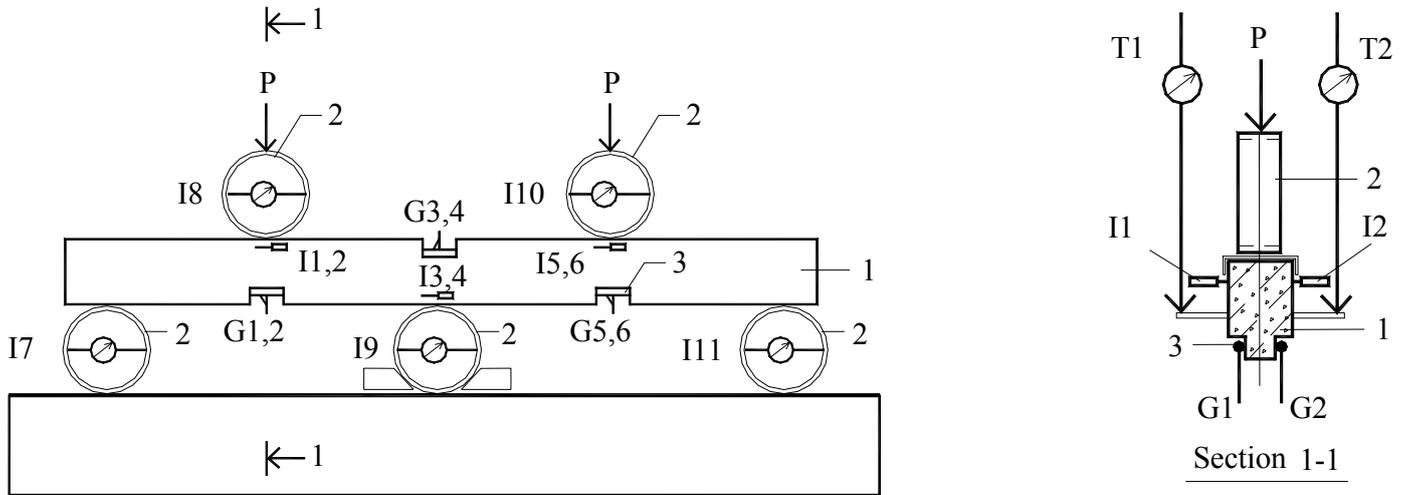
Test setup: 1- Reinforced concrete beam; 2 – Steel rings; I1-6=indicator for measurement of strain in concrete; I7-11=indicator for measurement of reactions and applied loads; G-gauge for measurement of strain in steel bars; D-linear differential transformers for measurement of deflection.
